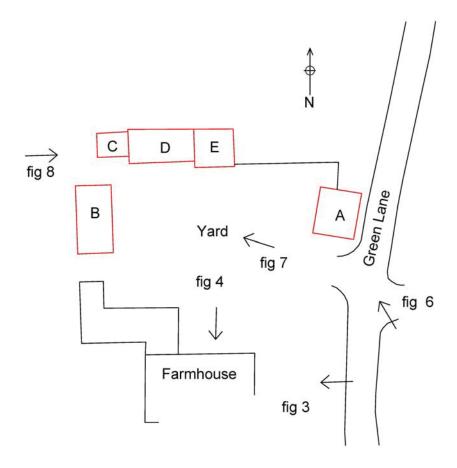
Block plan showing location of farm buildings A-E surrounding the central farmyard and location of photographs (Figs. 3-4, 7-8).
